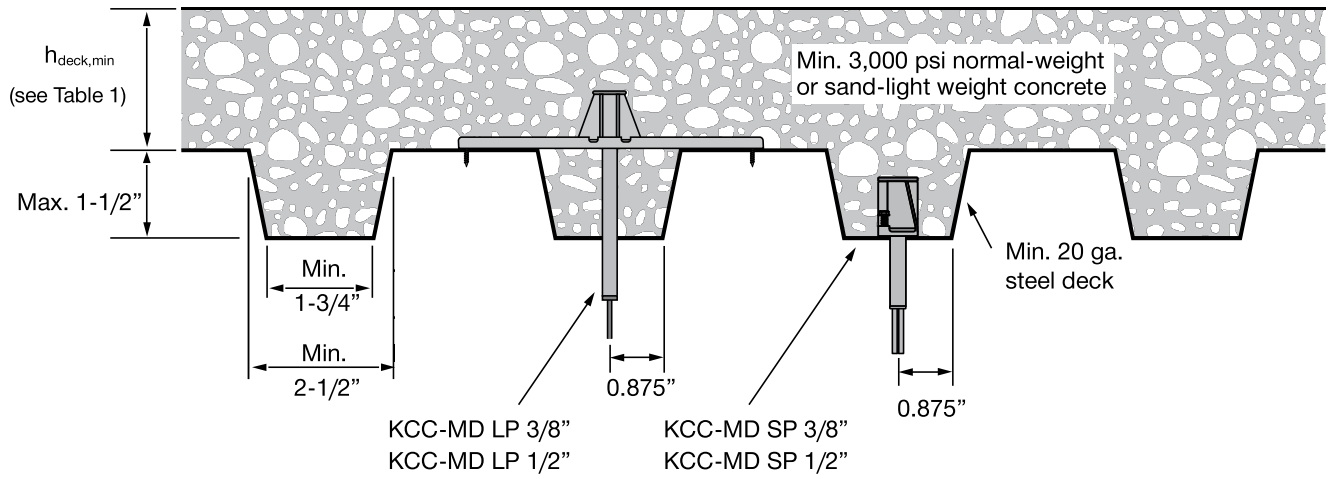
C — Installation of KCC-MD inserts in the soffit of concrete filled metal deck floor and roof assemblies-over lower flute (B-deck)
